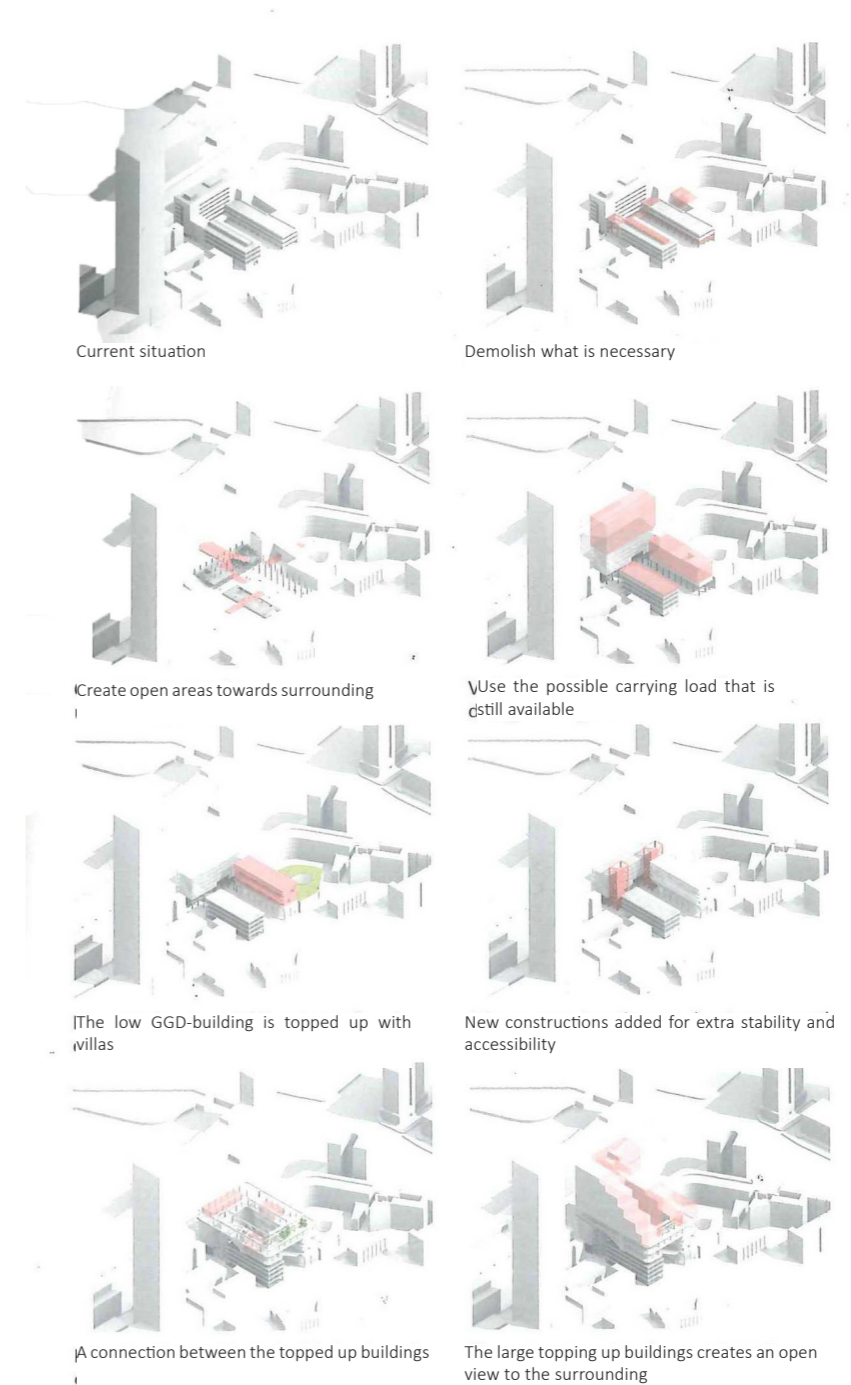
| Step by step these images show what is added to the current situation. Extra load is added to the existing construction, but new elements are added as well. Besides extra floor space this design gives more public space on several levels. (Source: (Sansón & Schoorl, 2017), p. 93)
